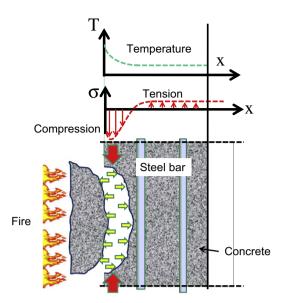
Spalling mechanism: thermal dilation.
